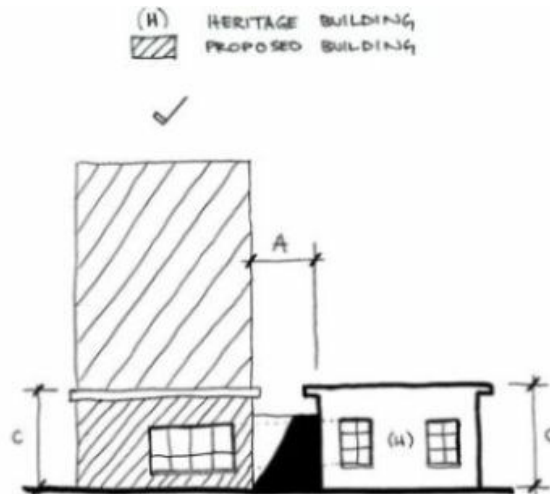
Illustration of building setback of taller new building. "A" is equal or greater than 3m
